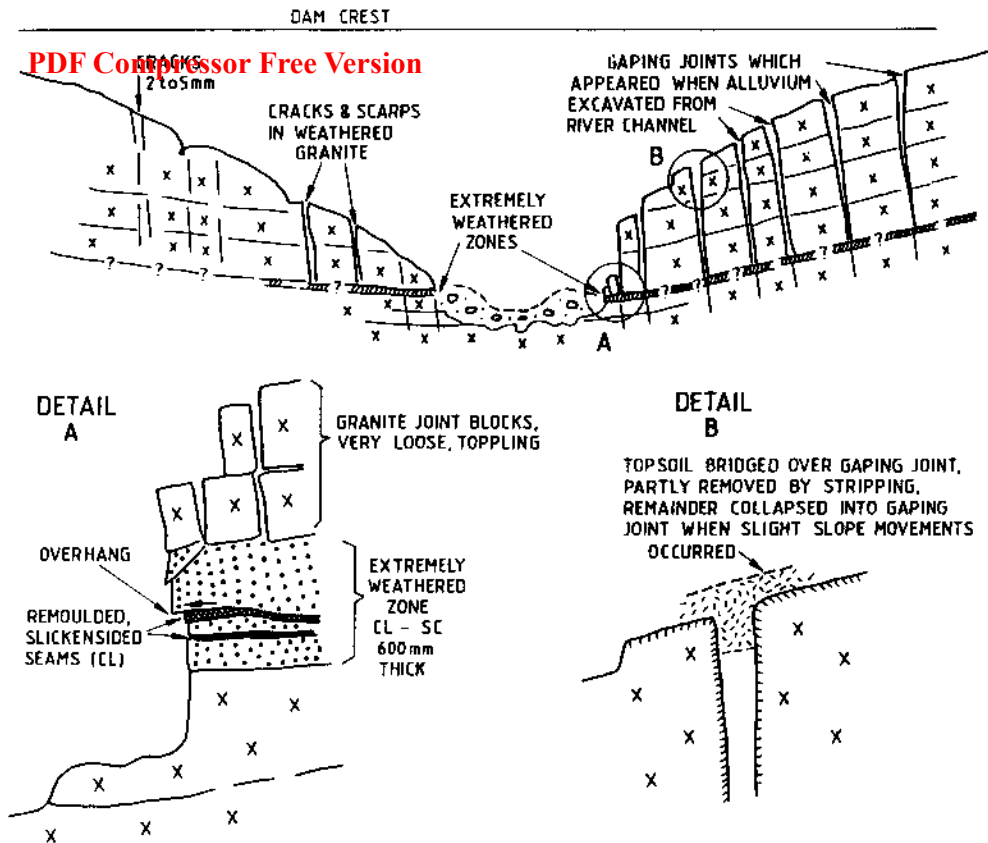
Tooma Dam, cross section and sketches through downstream shoulder.
